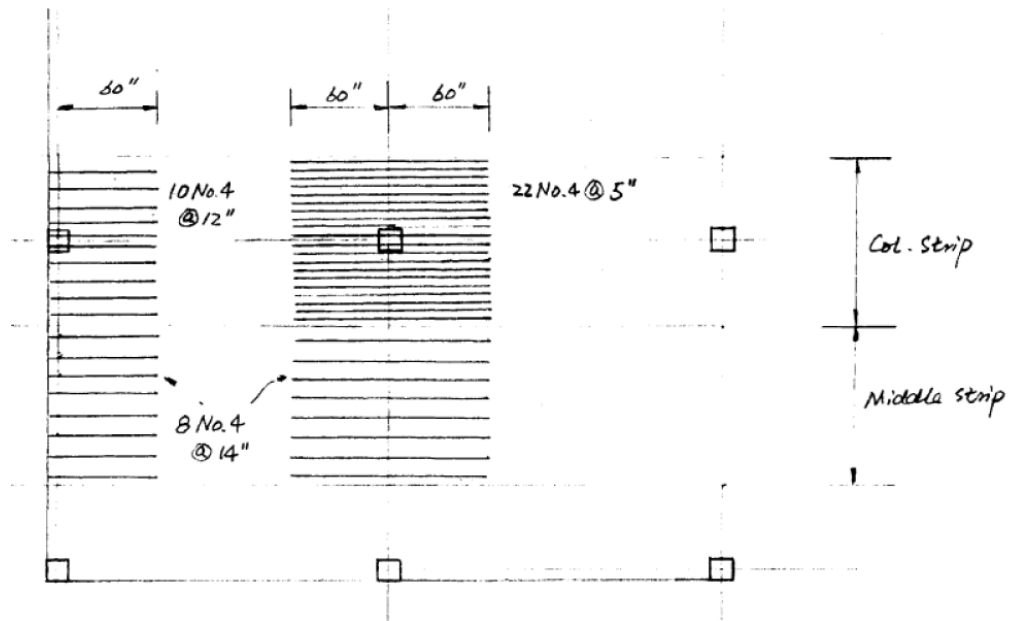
Initial sketch of top reinforcement in the prototype structure
